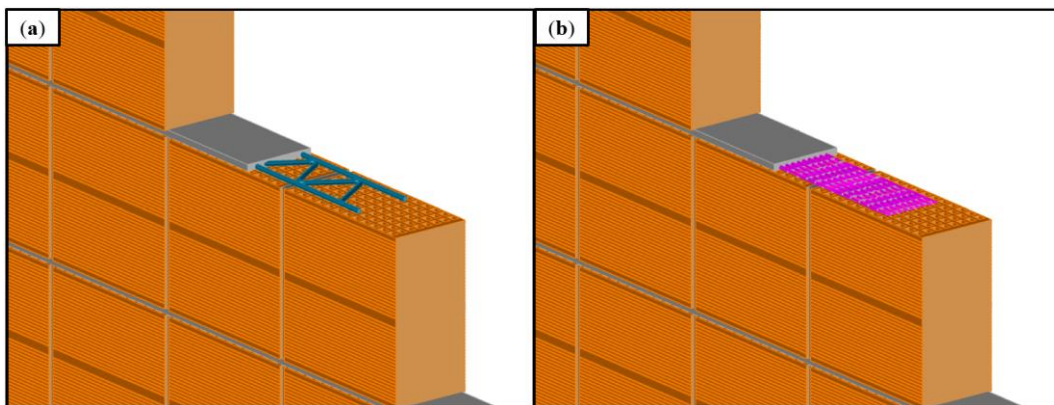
Anti-overturning measures for external walls and partitions: (a) horizontal steel bars; (b) light mesh to be embedded within the plaster;
